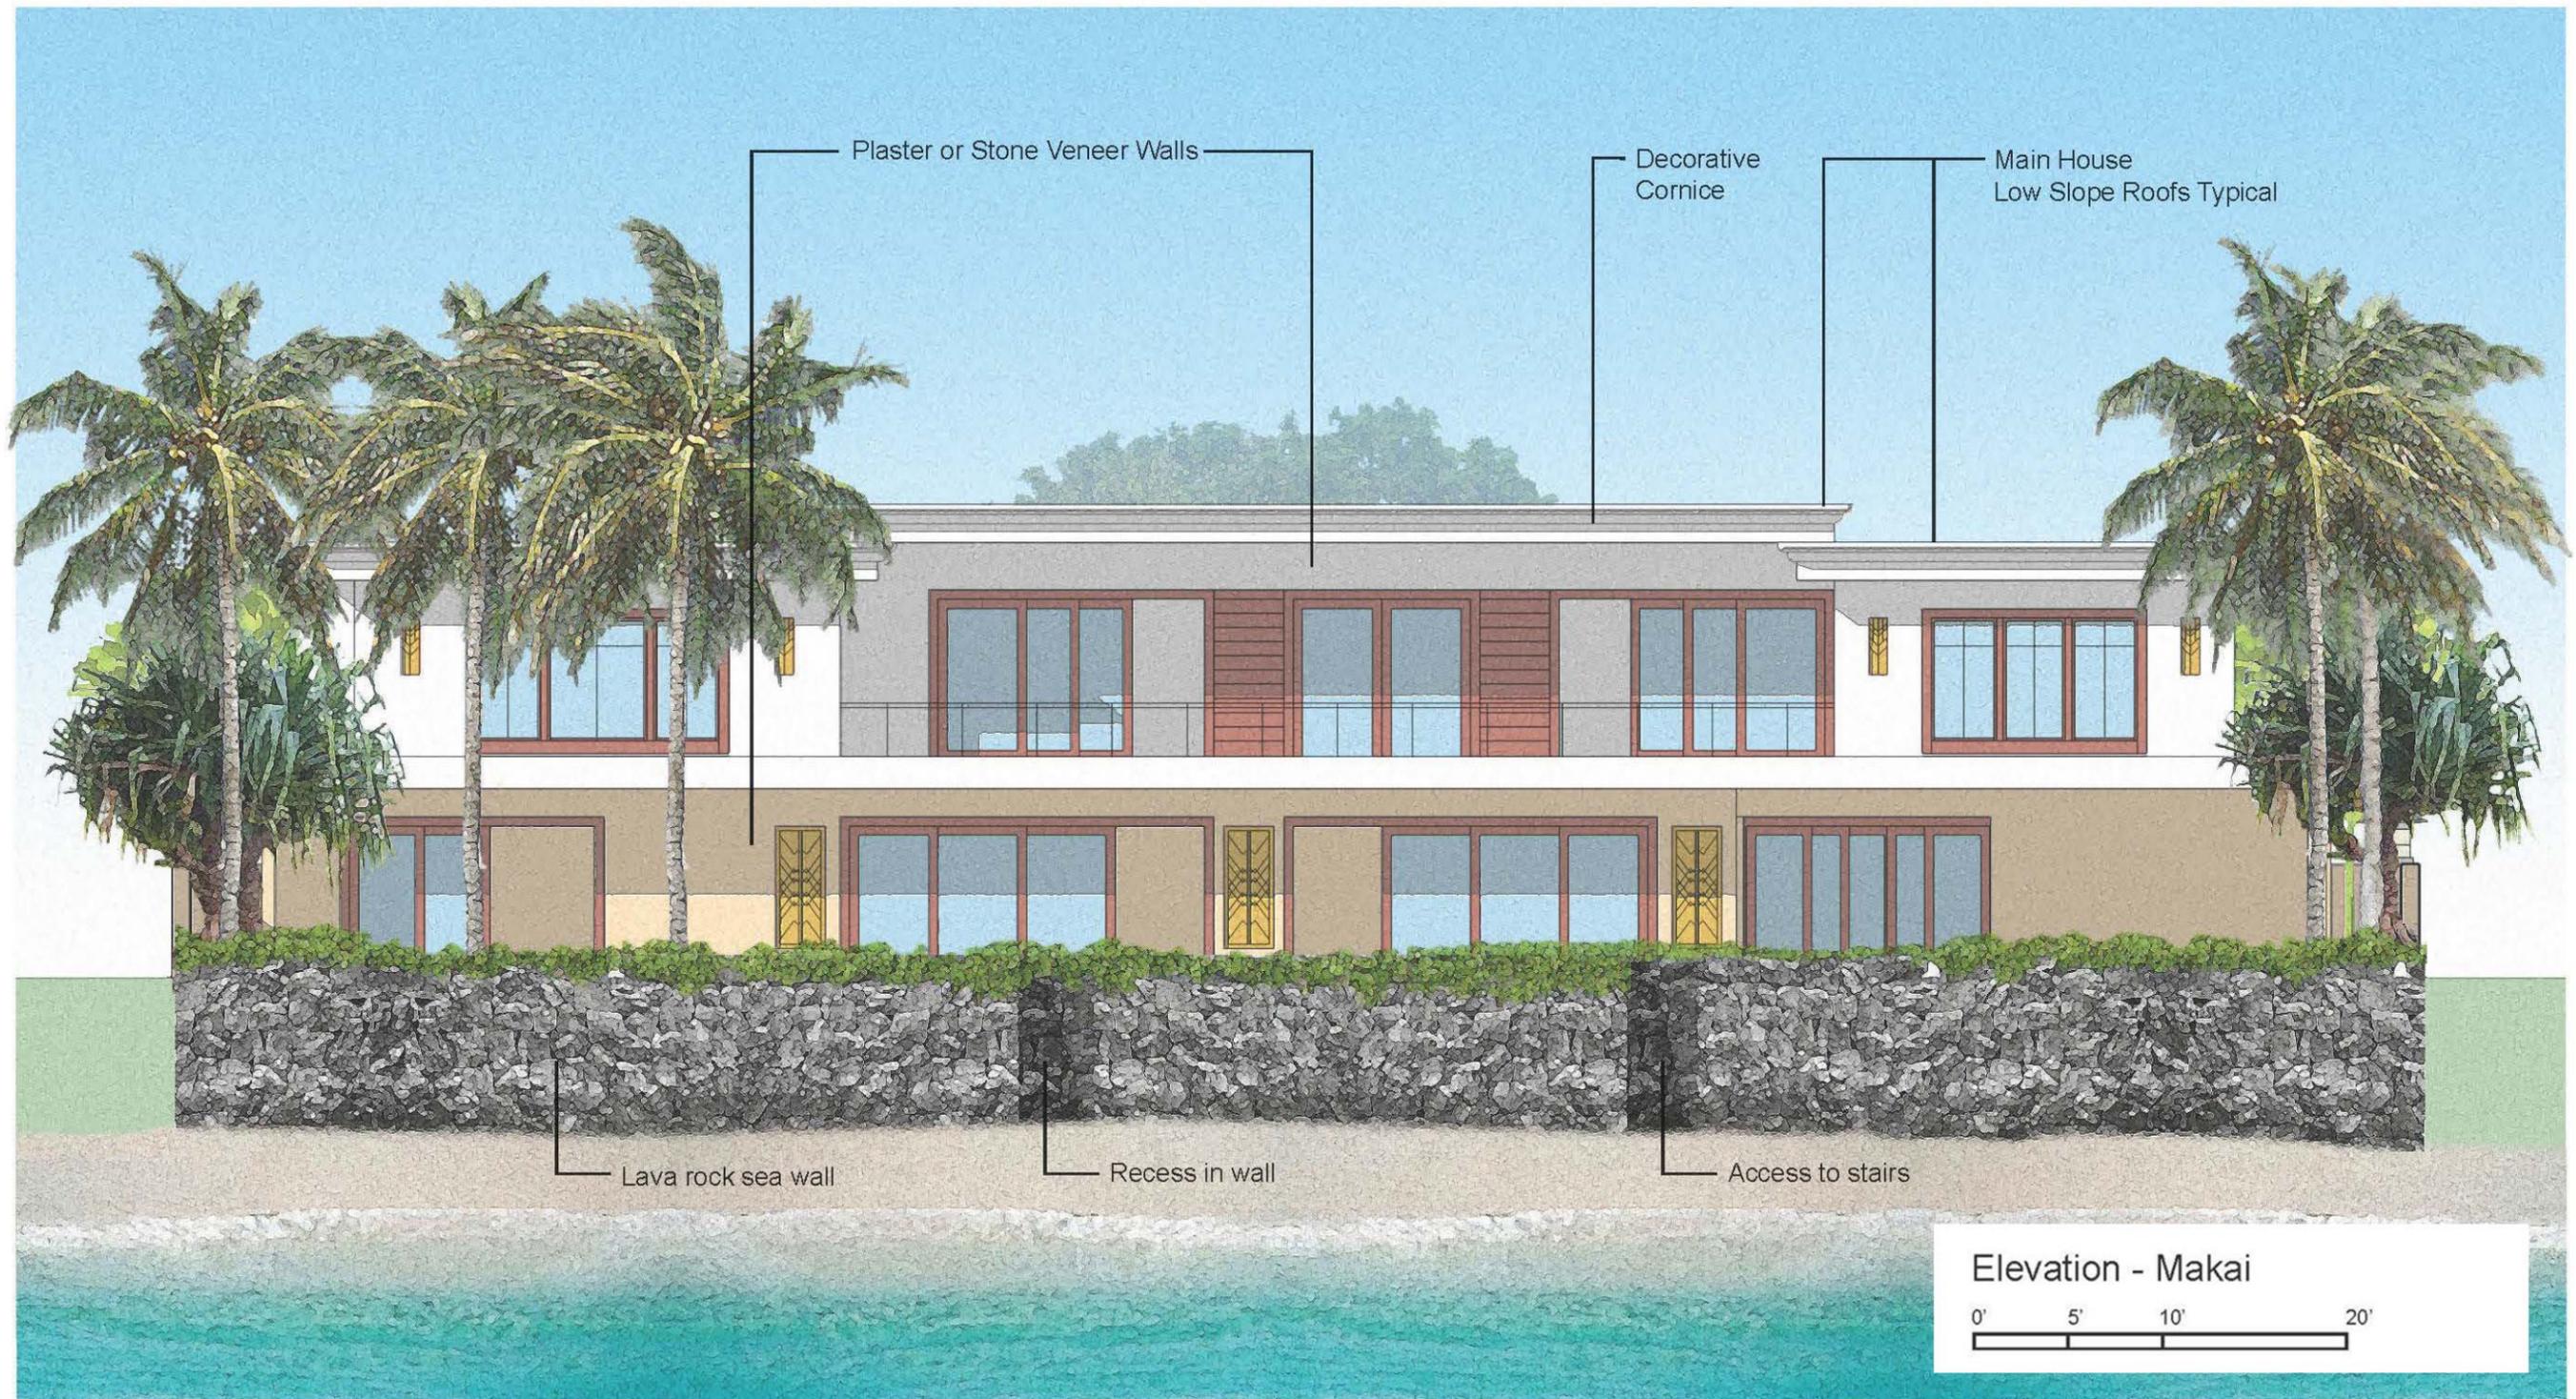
ELEVATION – MAKAI (NOT TO SCALE) (2/7/14)
